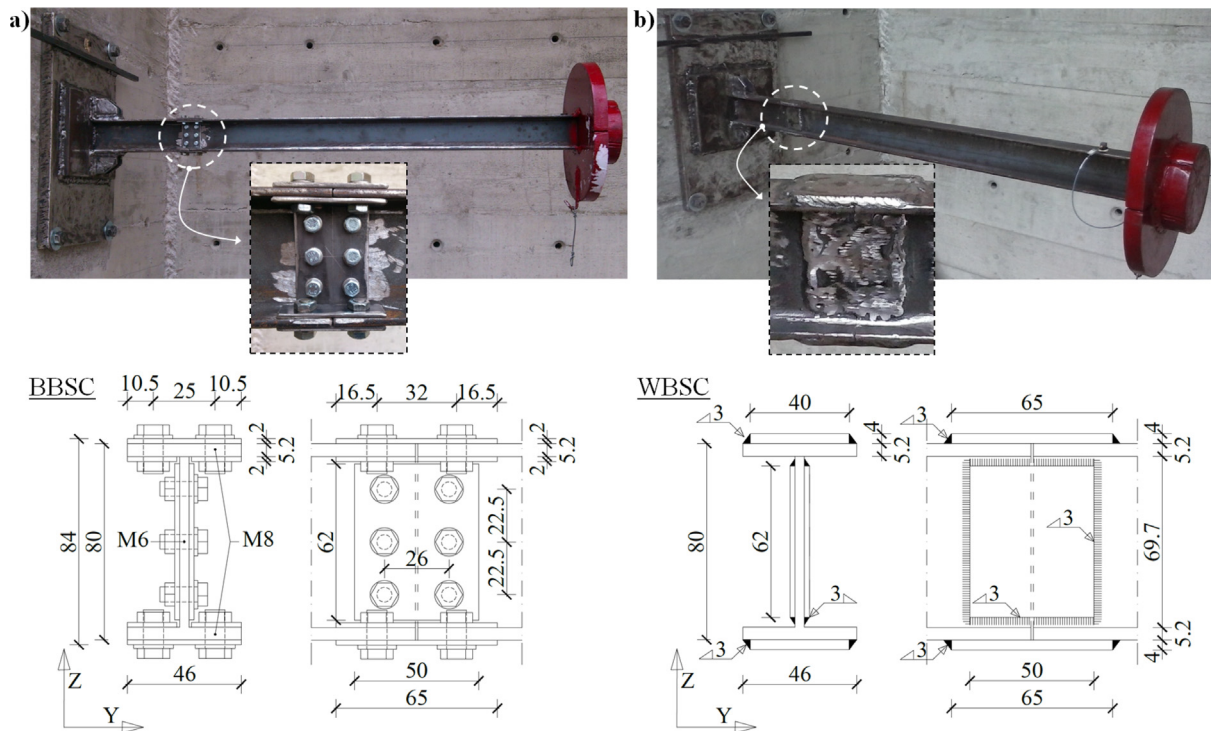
Experimental setup. Images and detailed drawings of connections in physical models. (a) Bolted beam splice connection. (b) Welded beam splice connection.
